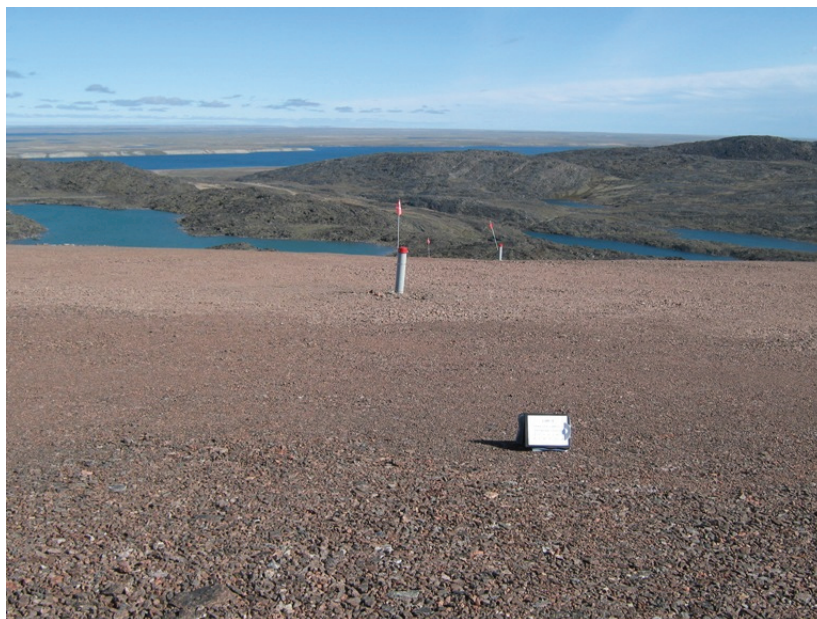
Panoramic photo facing southeast towards west slope of Upper Site Landfill.
